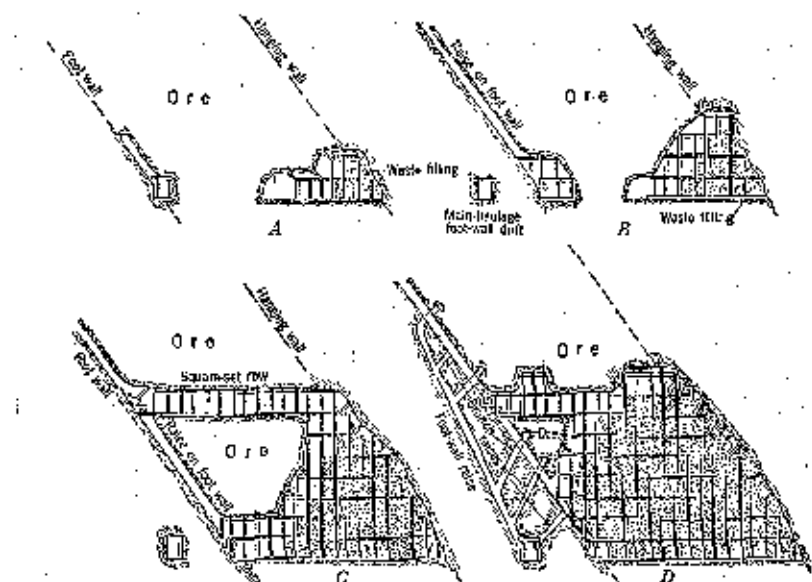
Square-set stopping system, Bunker Hill & Sullivan mine, Idaho: A, Stopping begun at hanging wall and raise started on footwall; B, stopping advancing toward footwall, raise on footwall completed, and main haulage drift advancing in footwall; C, sill floor completely developed and lift of scope connected to raise; D, first lift of stope nearly completed and footwall and branch raise from haulage drift completed.
